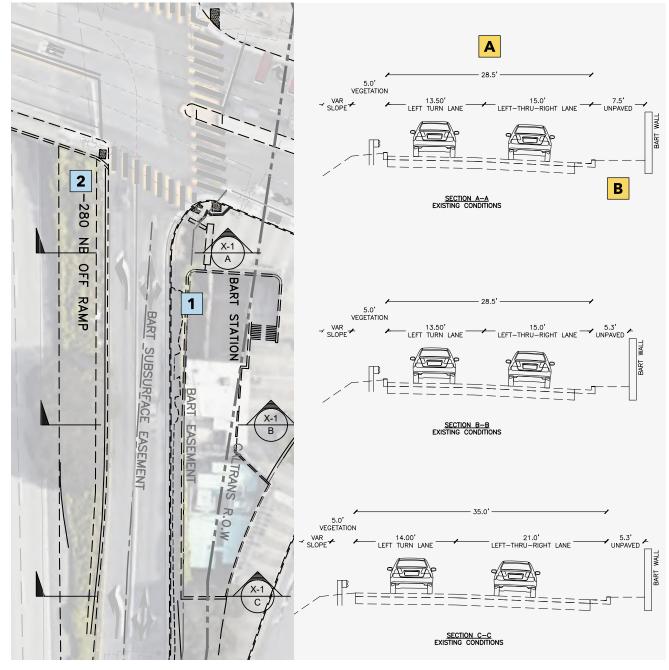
Existing Northbound I-280 Off-Ramp to Geneva Avenue Layout and Cross-Sections
